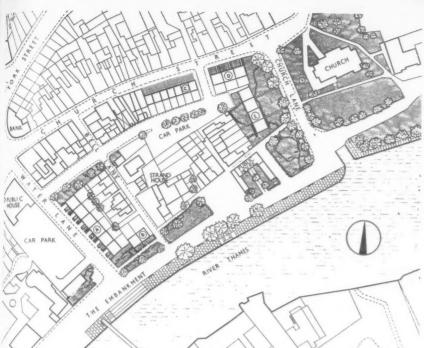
The plan produced by the Borough Council which, though an improvement over earlier efforts, still interprets improvement as meaning road widening.
